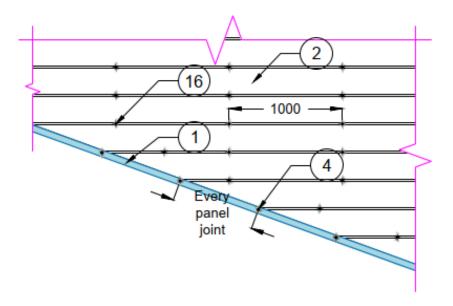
Horizontal Speedpanel wall connected to stair stringer (elevation view)
